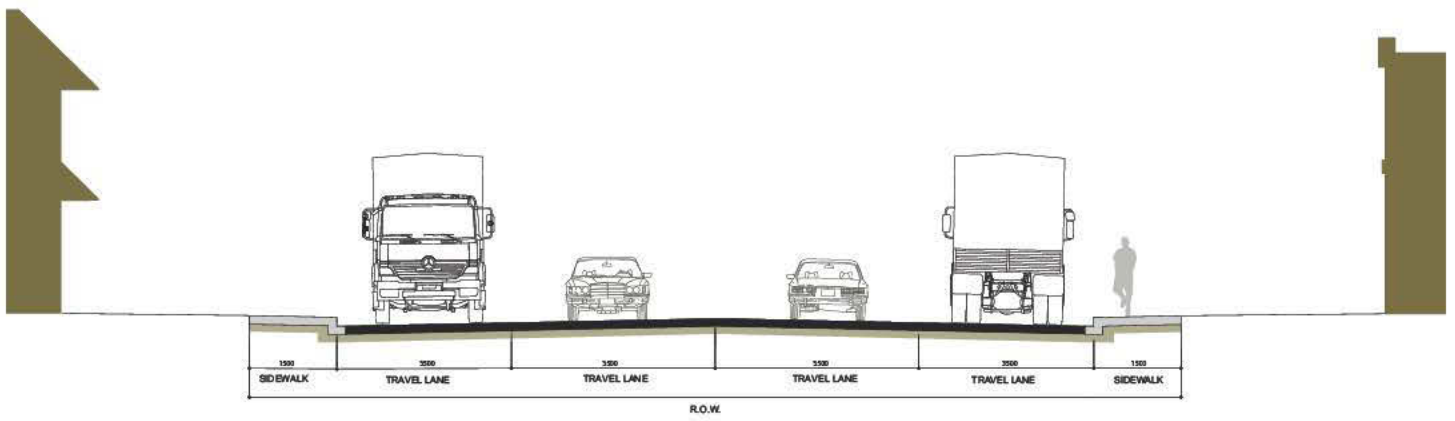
EXISTING HWY 27 STREET SECTION
